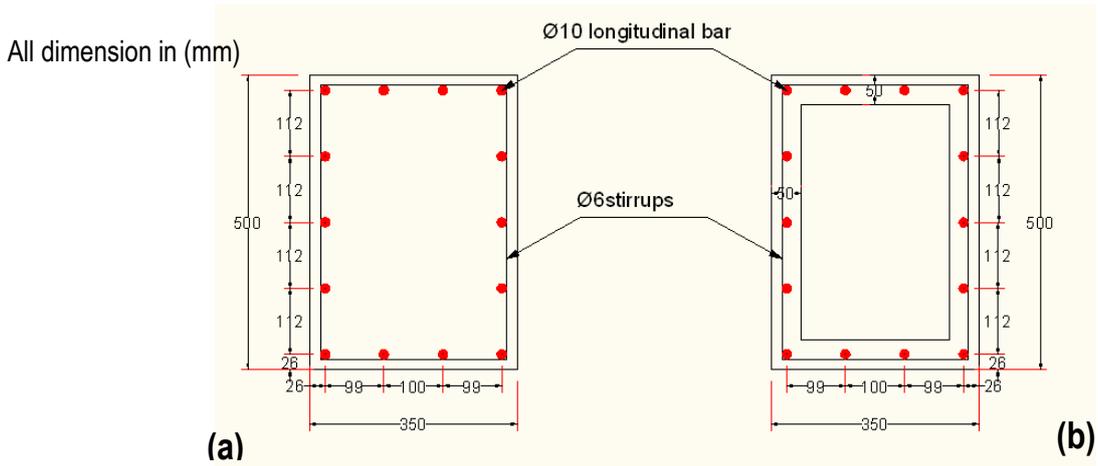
; Steel reinforcement layout of (a) solid beams (b) box-section beams .
